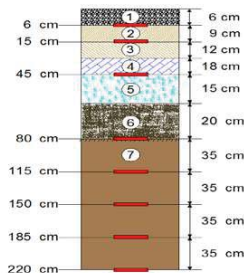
Scheme for location of sensors in pavement structure and subgrade for section with asphalt concrete pavement of "Astana-Burabai" highway: 1...6 – numbers of pavement layers; 7 – subgrade; ■ – temperature and moisture sensors
